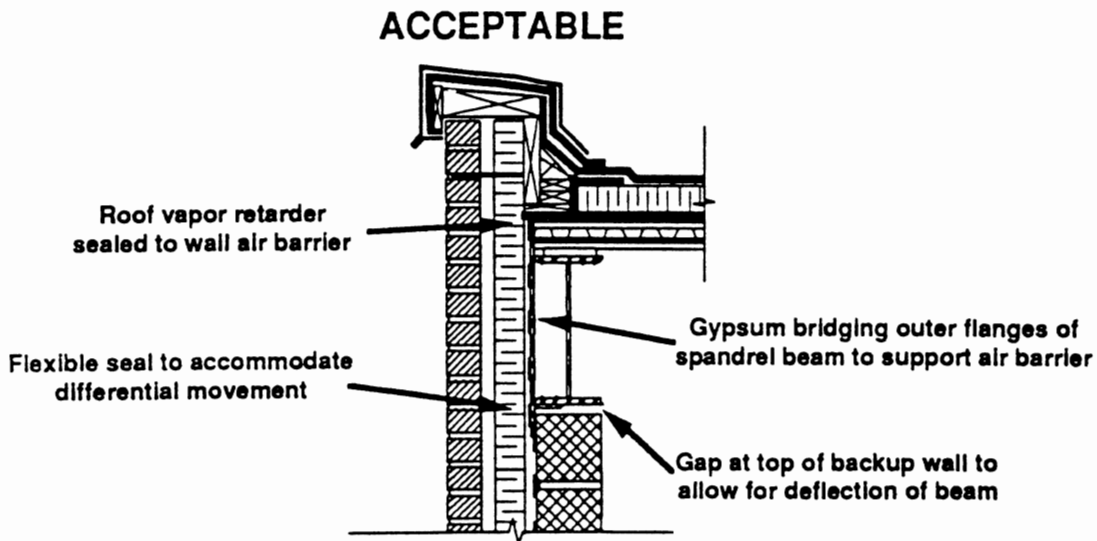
Masonry Wall/Roof Edge - Steel Frame (Burn)
